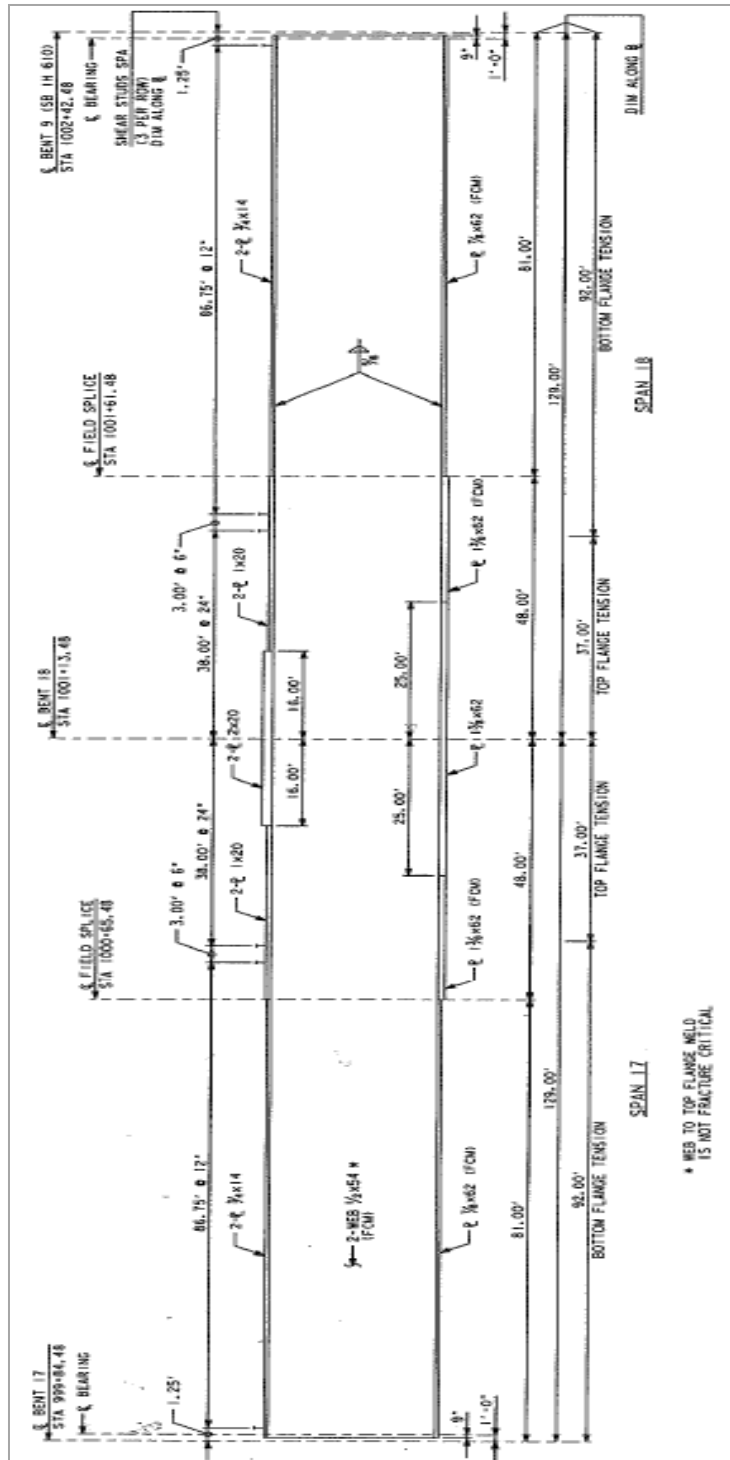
Elevation view of Woodway Bridge Span 17 & 18
